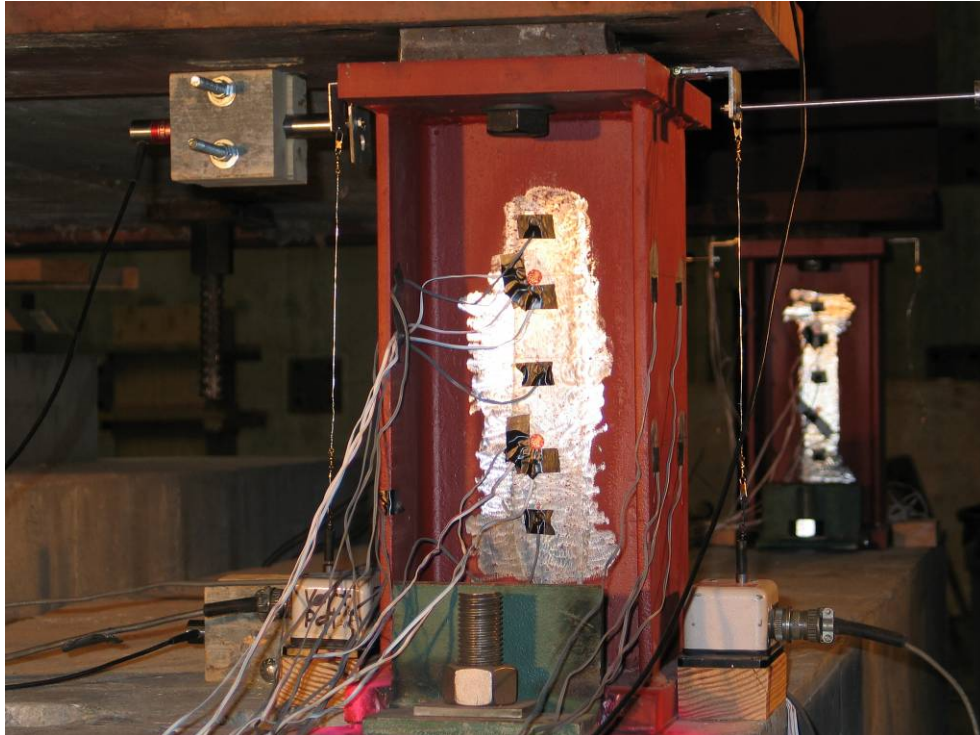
Short pedestals connected to the superstructure and substructure with stainless steel stud anchor bolts
